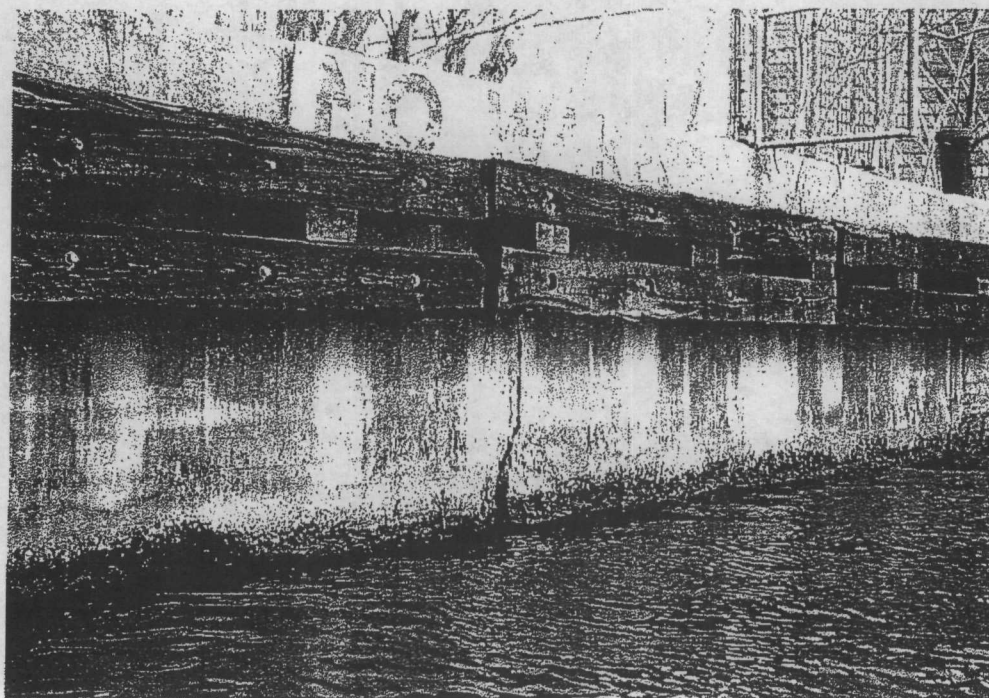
Overall View of South Dockwall Face, Looking Northwest from Station 3+66.
